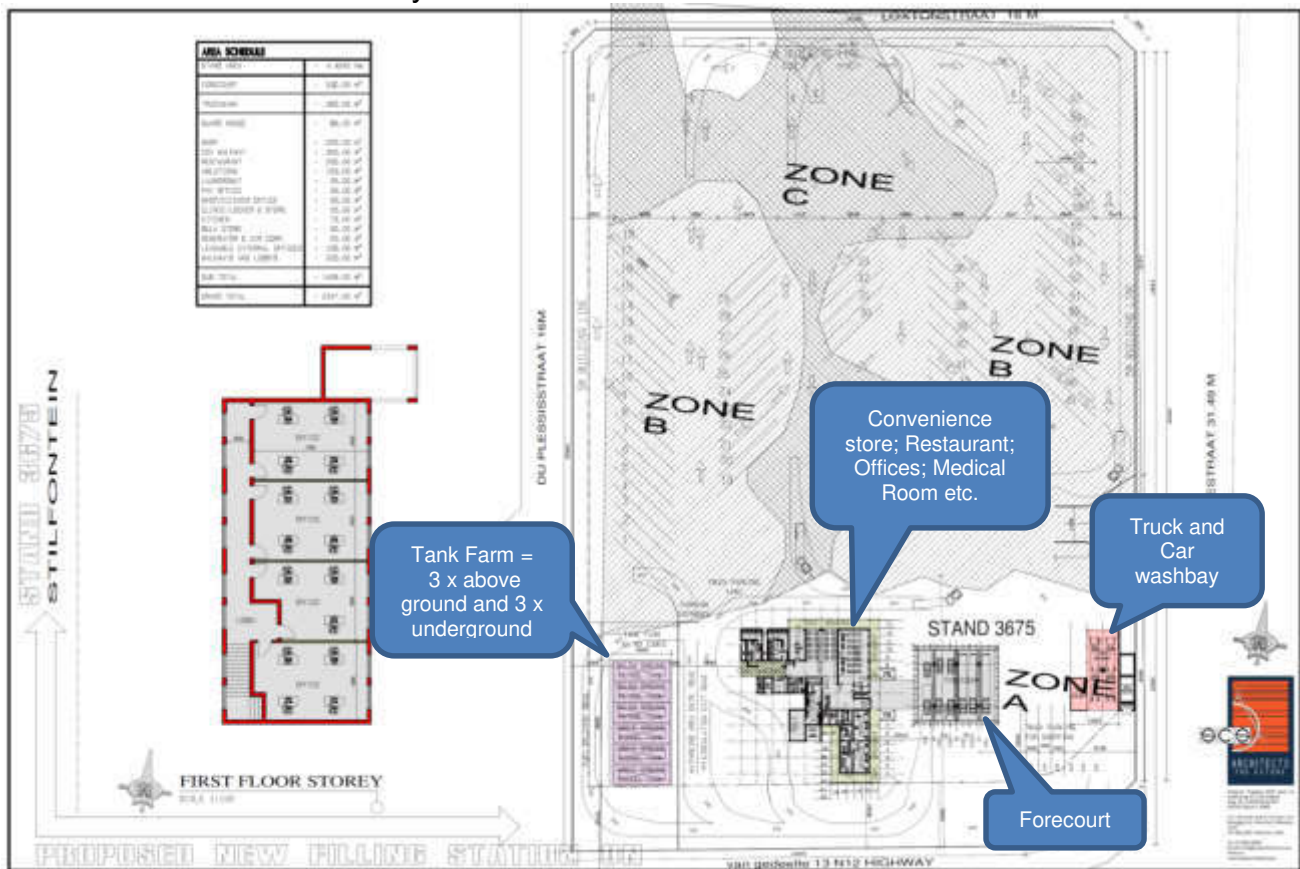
Proposed Layout (Please refer to Appendix A for Layout plans and Facility Illustration.)
